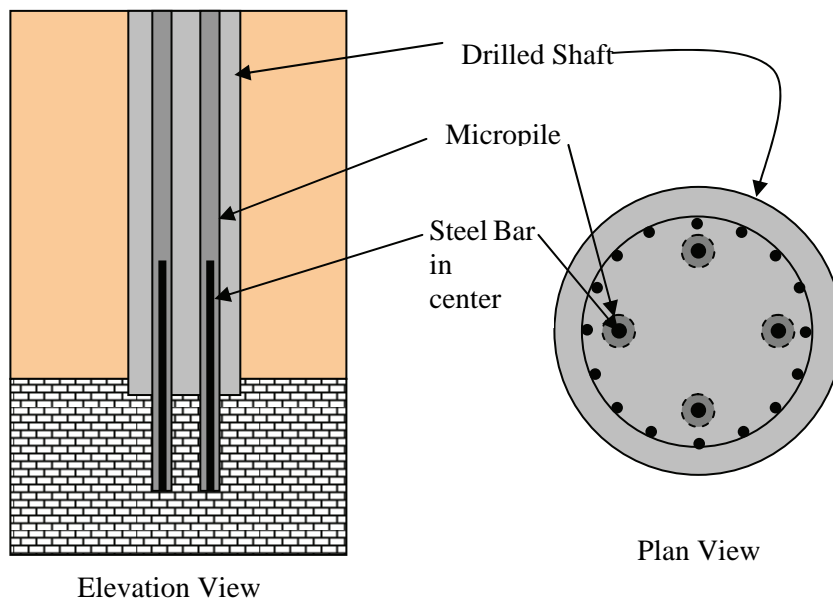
Use of Micropiles Drilled Through Existing Drilled Shaft
